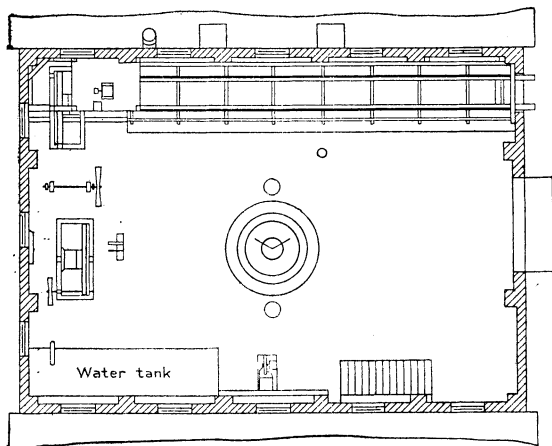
Plan of furnace house at Trollhättan, Sweden.
